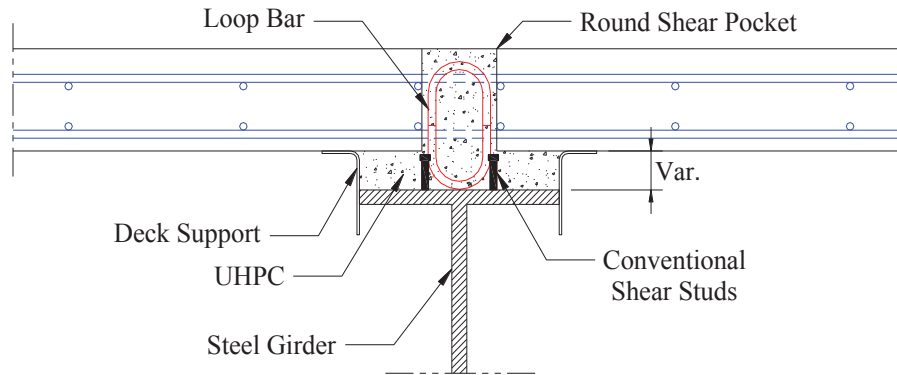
Proposed Precast Concrete Deck-To-Steel Girder Connection
